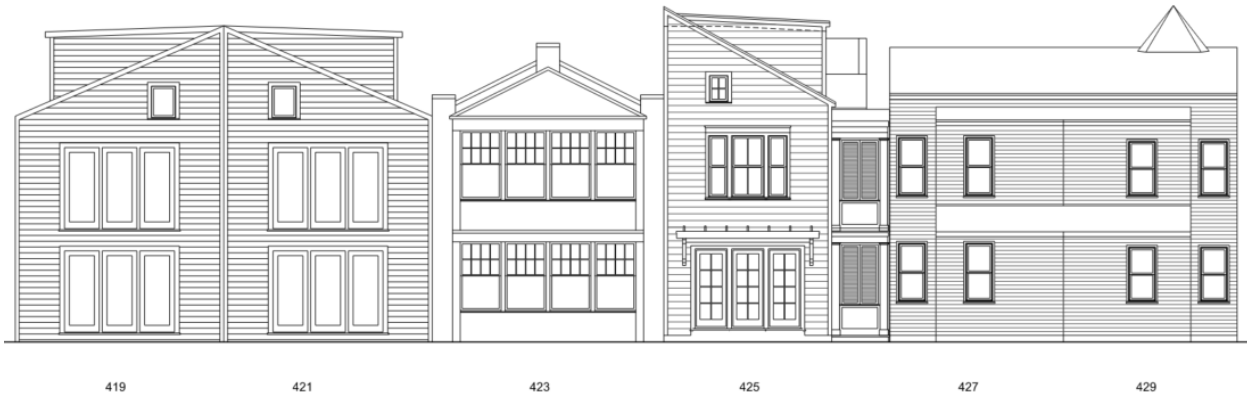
Elevation of blockface facing the alley behind the subject property including proposed addition
